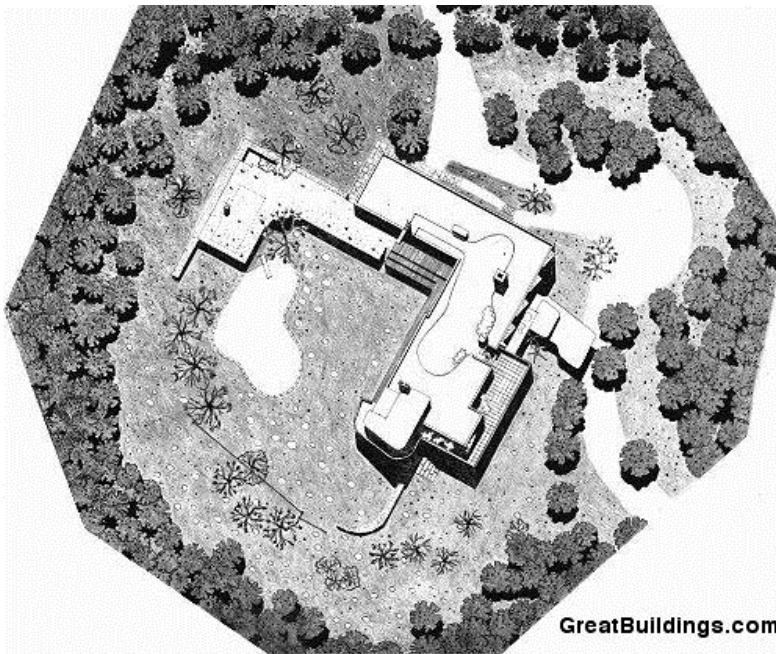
Villa Mairea Site Plan. Source: [http://www.greatbuildings.com/cgi-bin/gbc-drawing.cgi/Villa\\_Mairea.html/Villa\\_Mairea\\_Site\\_Plan.jpg](http://www.greatbuildings.com/cgi-bin/gbc-drawing.cgi/Villa_Mairea.html/Villa_Mairea_Site_Plan.jpg)
